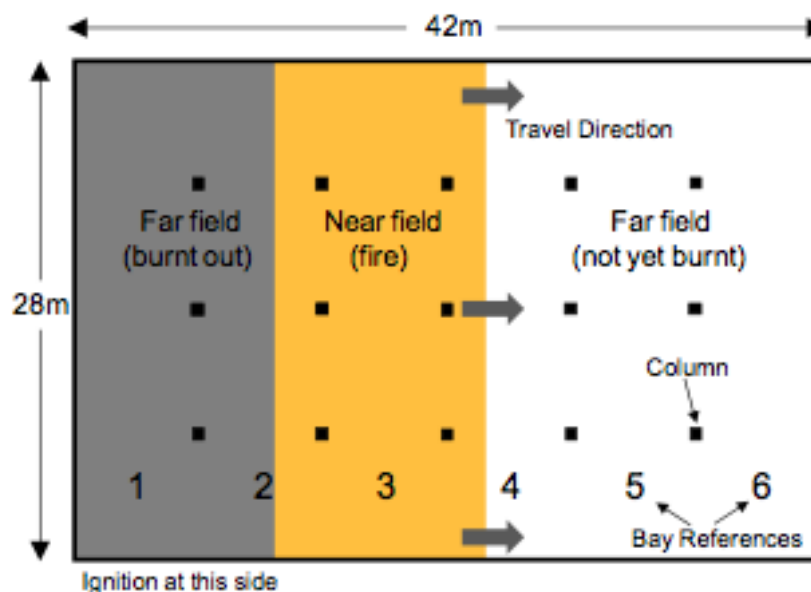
Plan of concrete structure where TFM is applied [27]
